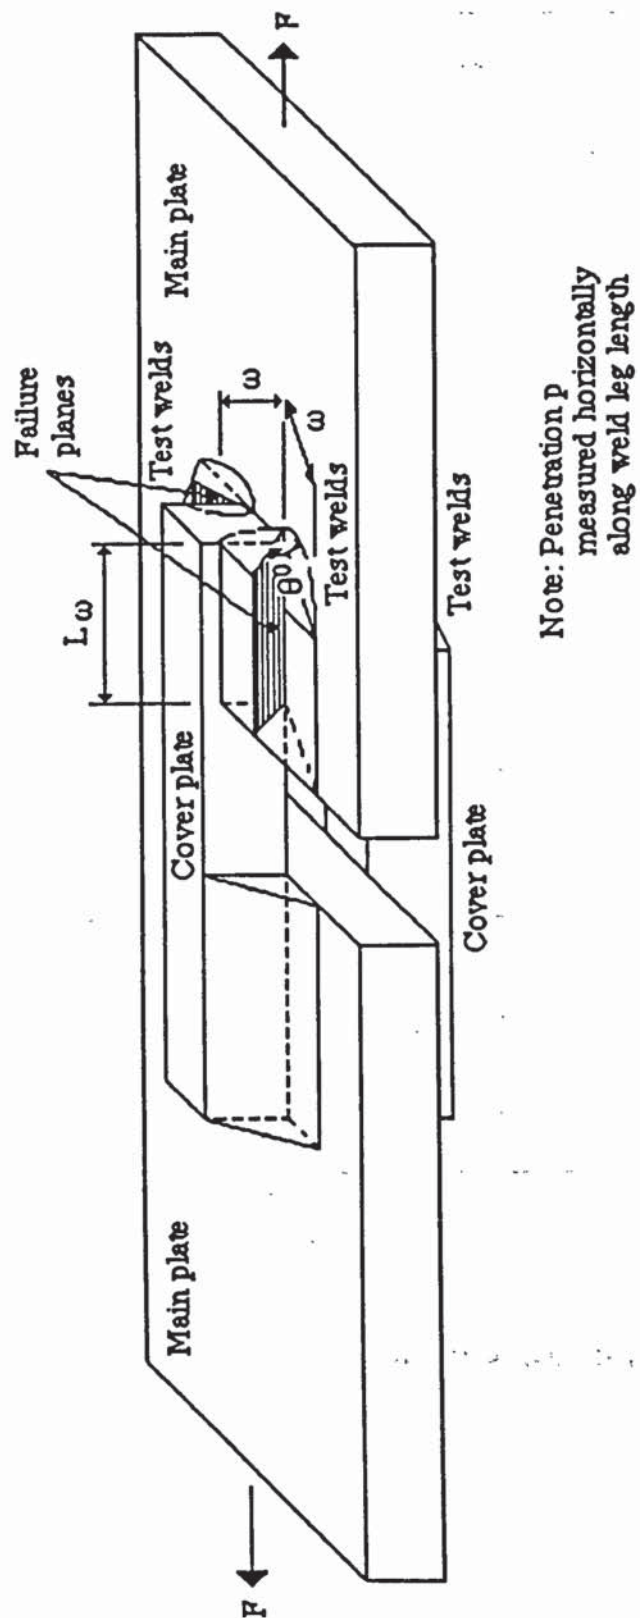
Test welds of the longitudinal fillet weld specimen.
